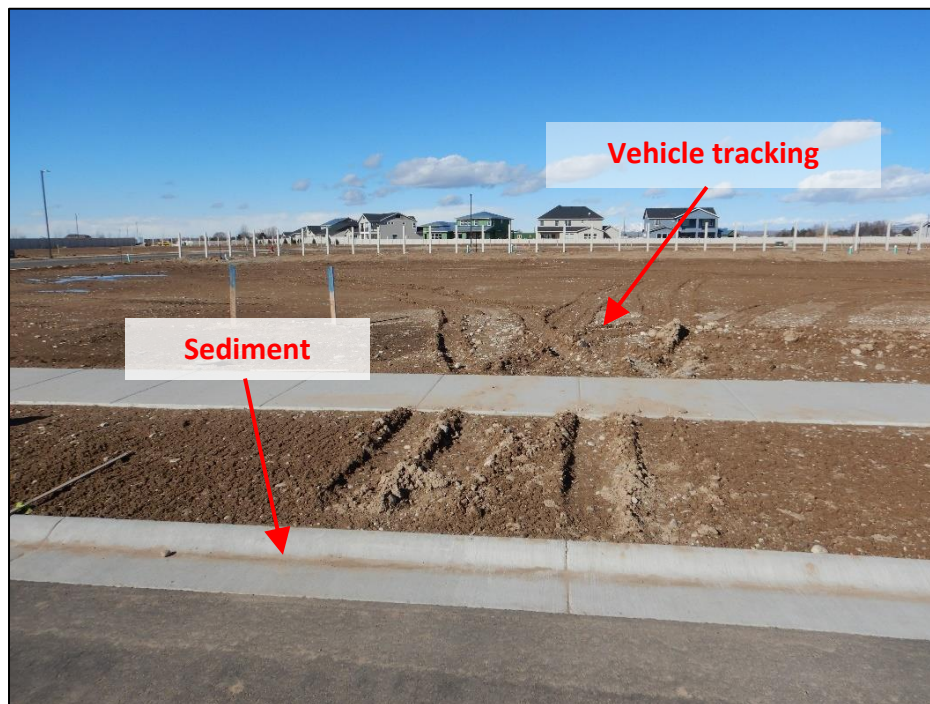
View, facing south, of an unprotected stockpile on North Sunfield Road. Note the vehicle track-out in the foreground.
